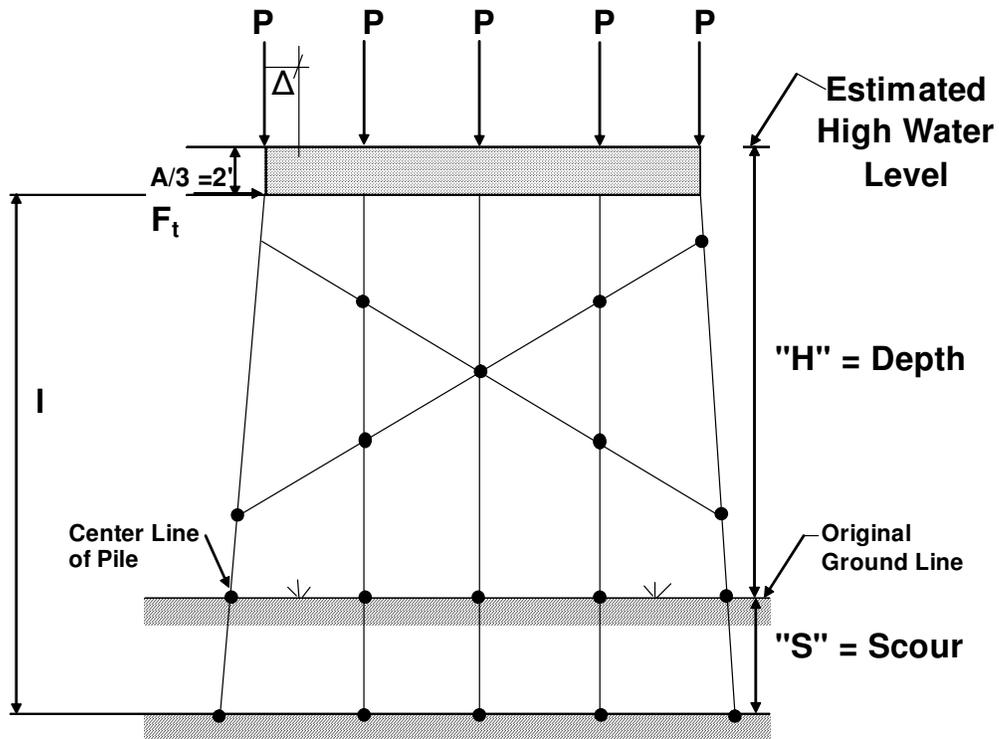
Typical X-braced Bent and Typical Loading Conditions
